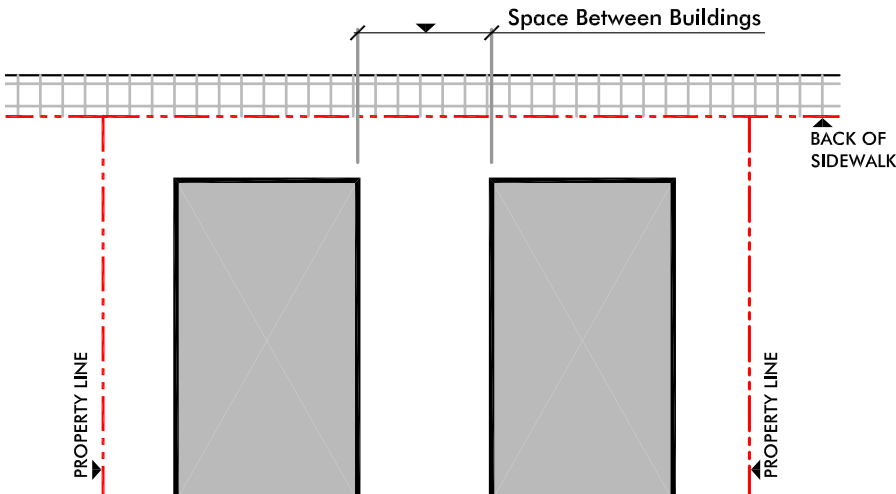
SPACE BETWEEN BUILDINGS
